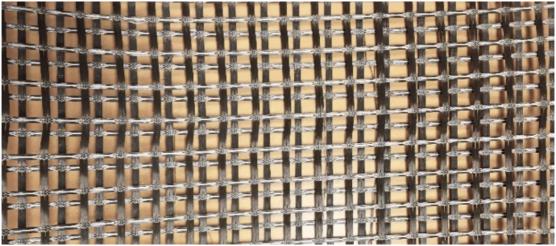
Two layer of reinforcement to create smaller holes in the open structure. (Photo: Ellen Simonsson)
